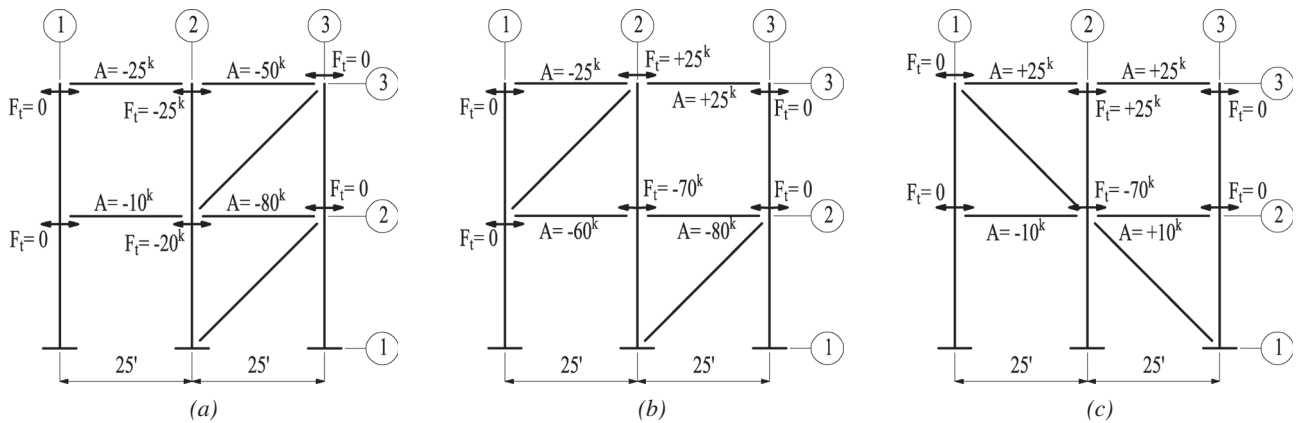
Transfer forces and axial loads in beams. (a) Bracing arrangement 1. (b) Bracing arrangement 2. (c) Bracing arrangement 3.
